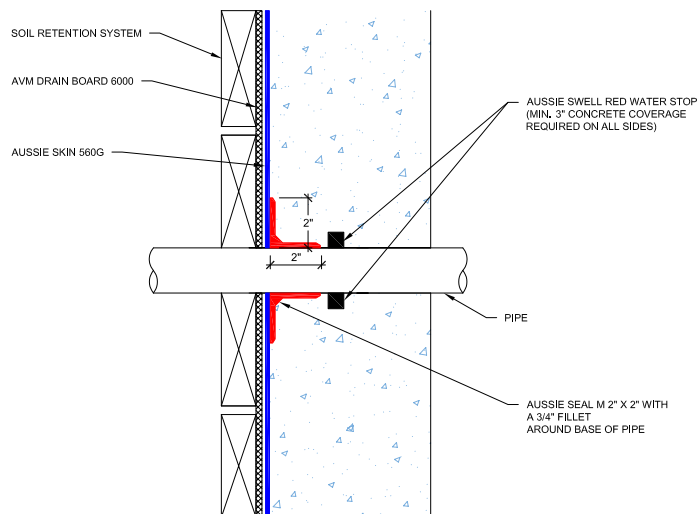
PIPE PENETRATION THROUGH WALL
